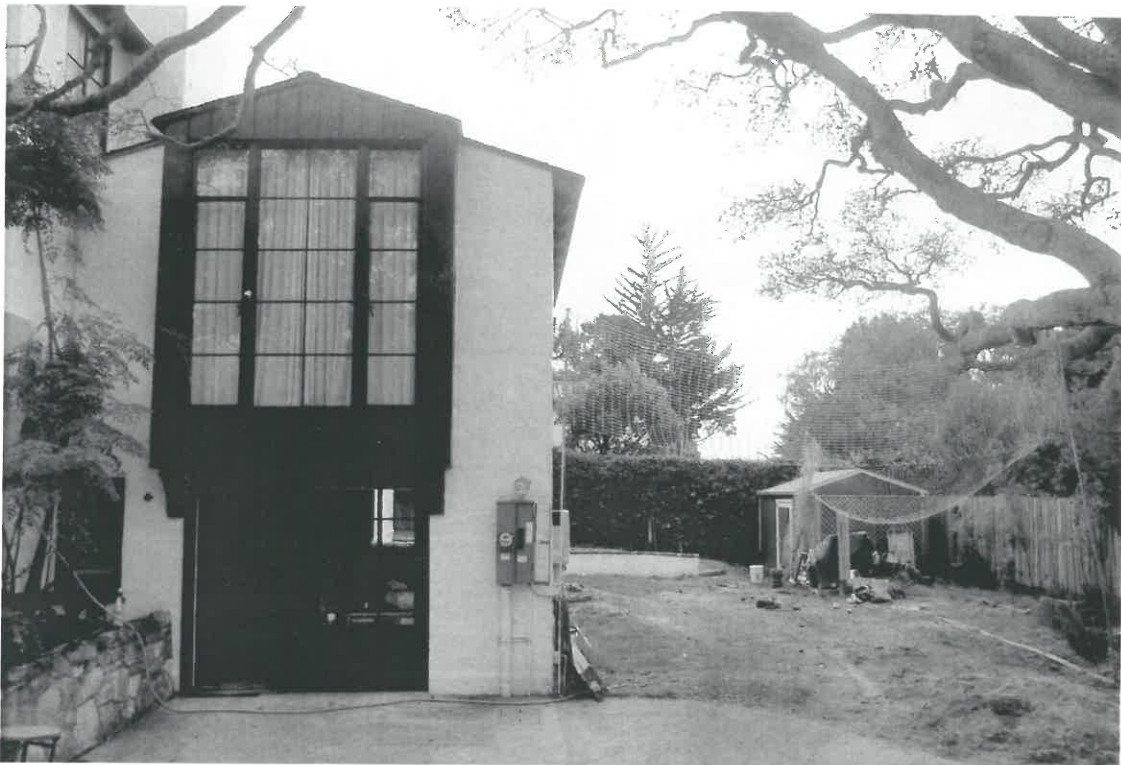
Looking south at the gabled wing adjacent to the site for the proposed Garage addition, January, 2018
